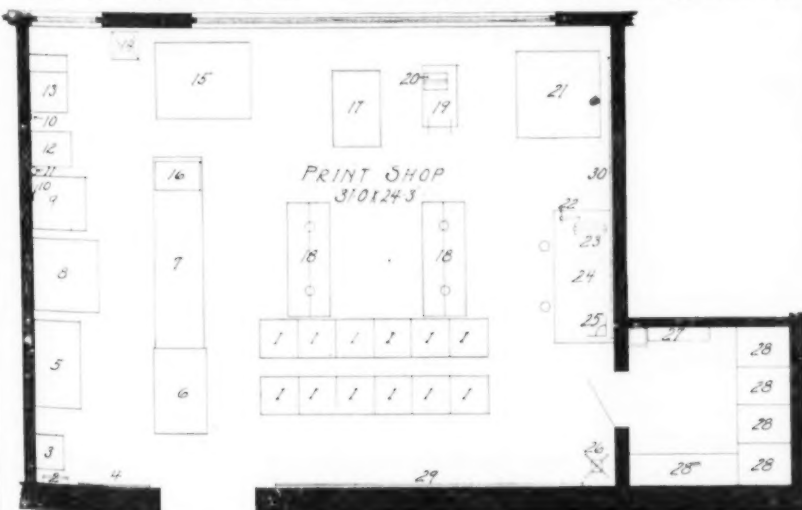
Well Planned Print Shop, with a Very Satisfactory Arrangement of Equipment. Total Floor Area 822 Square Feet.
